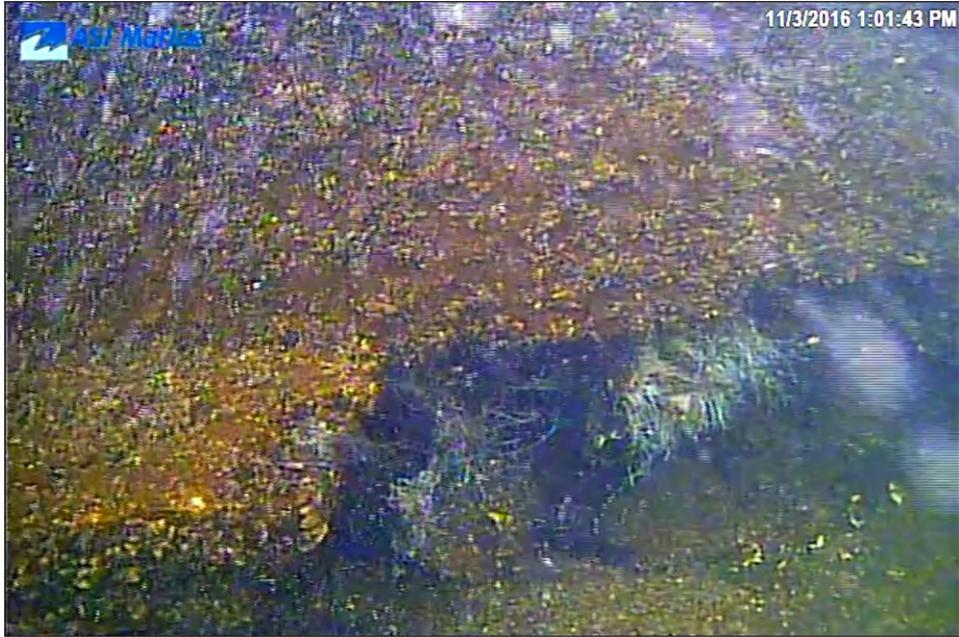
L-13: Lower approach wall undercutting of concrete on bottom on west side downstream of Pier 1.
